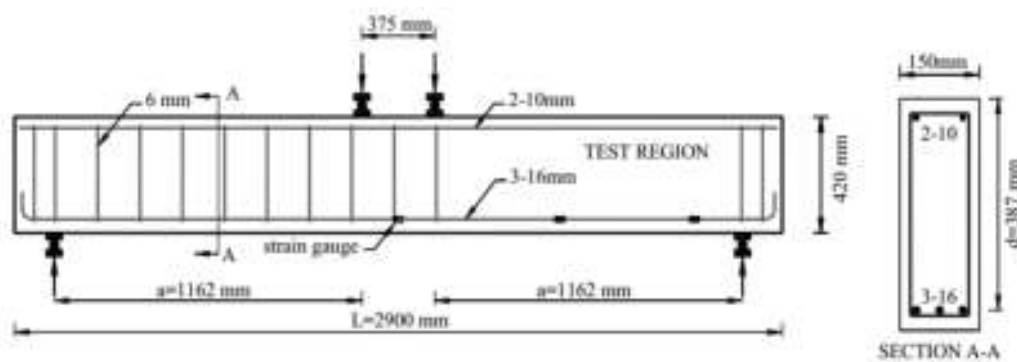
Detailing of the beams in Rahal and Alrefaei study [48]
